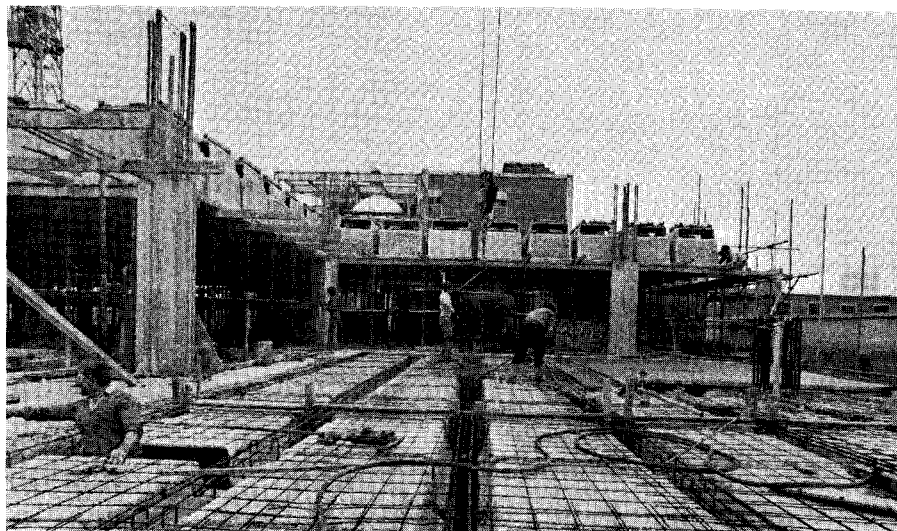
Permanent GRC forms for waffle floors in Trumans Brewery, London, England.
